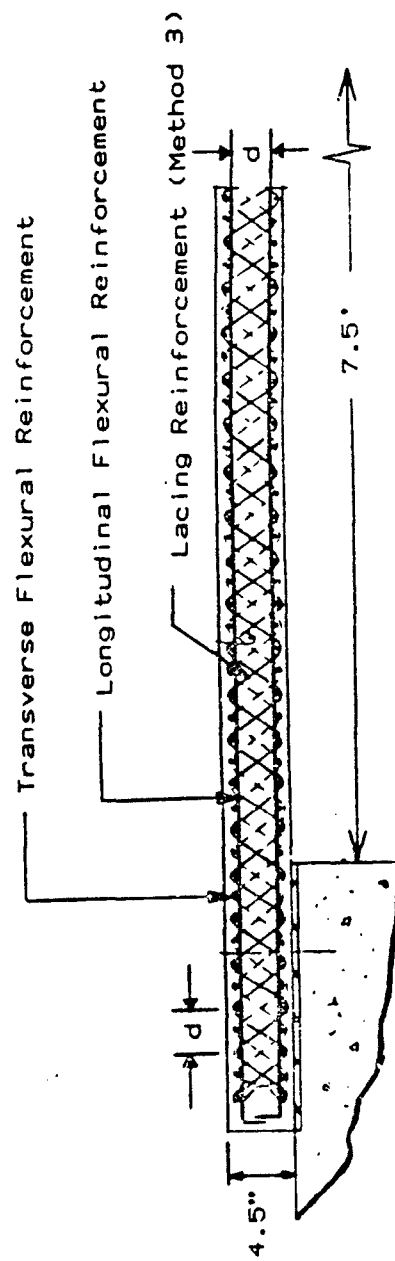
Typical Lacing Reinforcement (Slab Type II).
